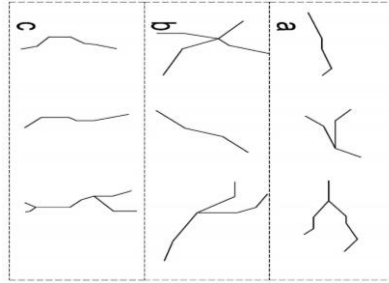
Illustrated different types of cracks, a. longitudinal cracks, b. diagonal cracks, and c. vertical crack
